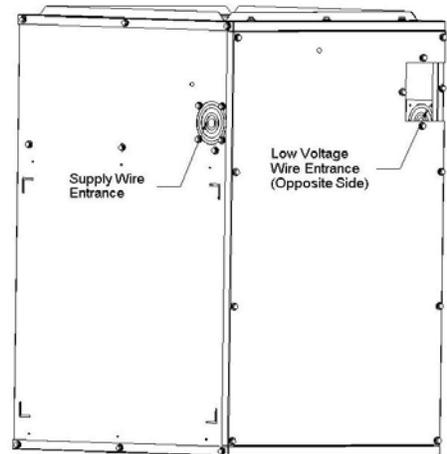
No Heat and Factory Installed Electric Heat Control Box Wiring Connection Locations
